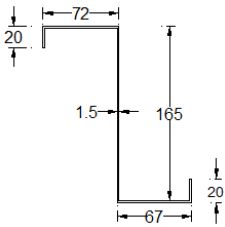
Details of cold formed Z section (all dimensions in mm)
